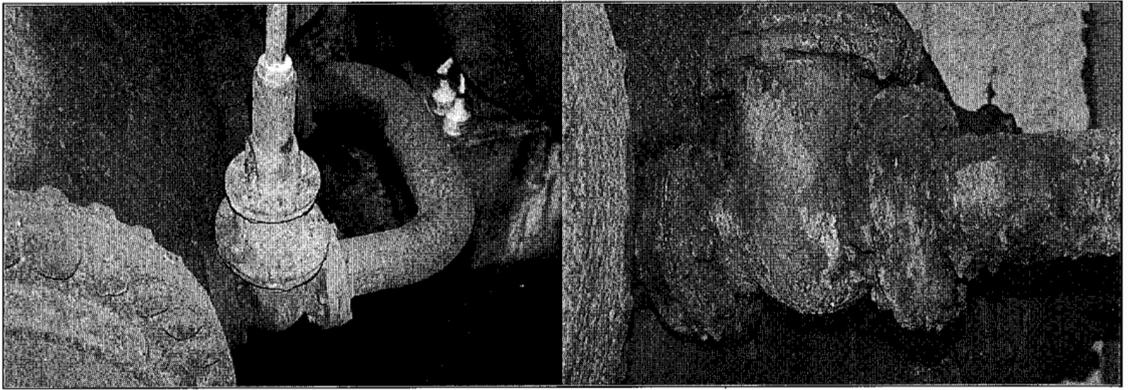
Rotary valve 5-inch auxiliary bypass valves showing extensive corrosion.
